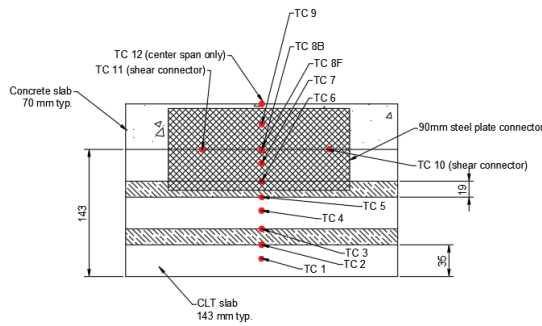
Thermocouples layout at Section M, where the maximum bending moment exists (sectional-elevation view)
